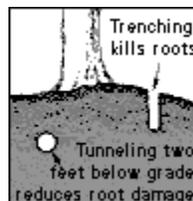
Protect roots from damage when laying utility lines by tunneling rather than trenching.
